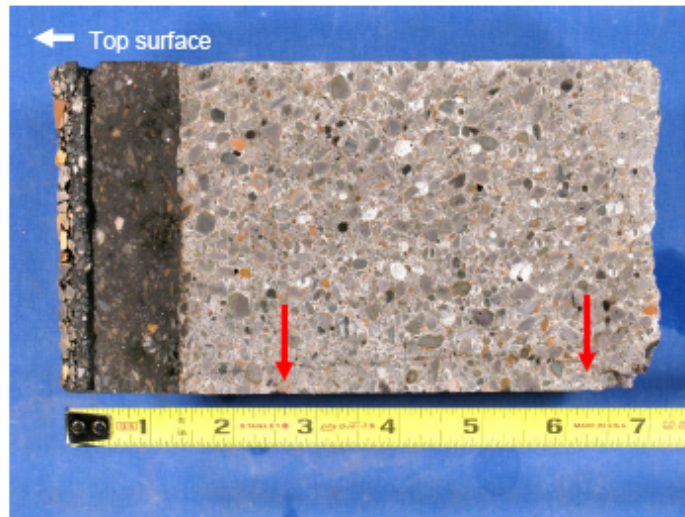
Cut and lapped cross-section of Core C3S4 showing general appearance of the topping and the concrete. Arrows indicate a vertical crack in the concrete. Top surface is to the left. Scale is marked in inches.
